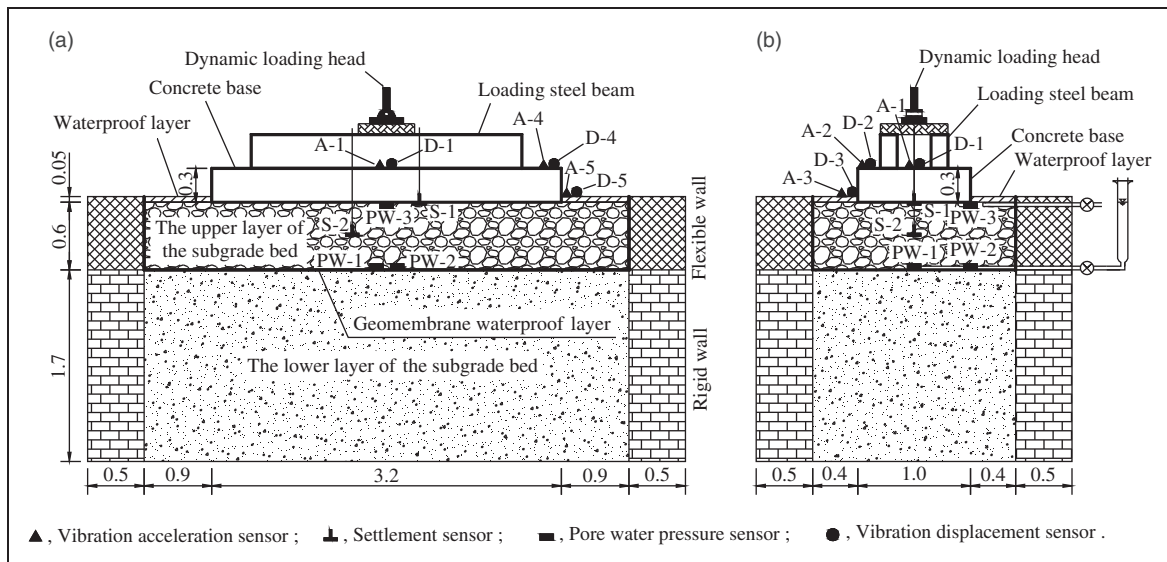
A full-scale model of the slab track–subgrade: (a) cross-sectional view; (b) longitudinal section view (unit in m).
